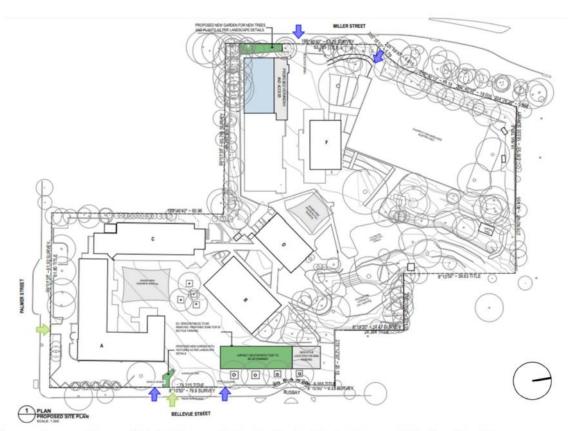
Proposed Scope of Works (Source: Fulton Trotter Architects, Proposed Site Plan (Rev 6))
